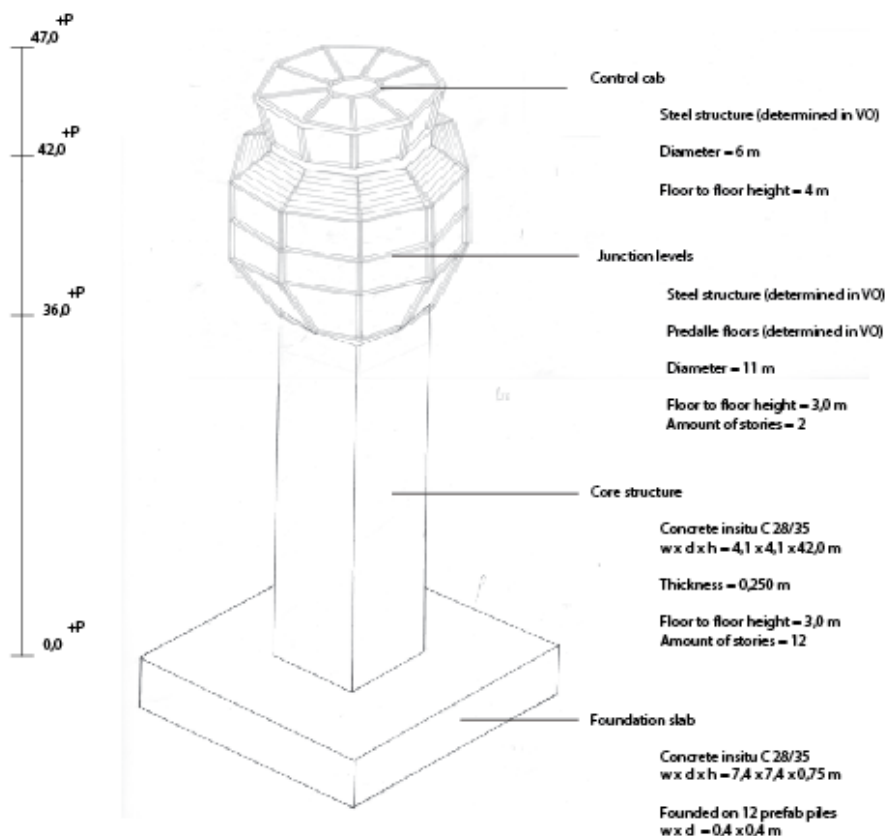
Concept design Lelystad airport, concrete core in-situ
